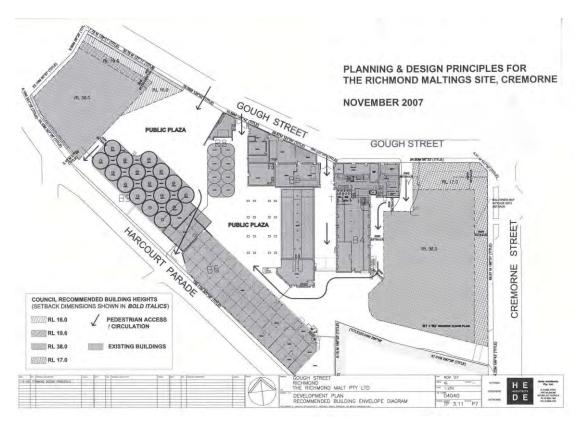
Development Plan recommended Building Envelope DiagramSource: Yarra Planning Scheme, Schedule 3 to the Comprehensive Development Zone
